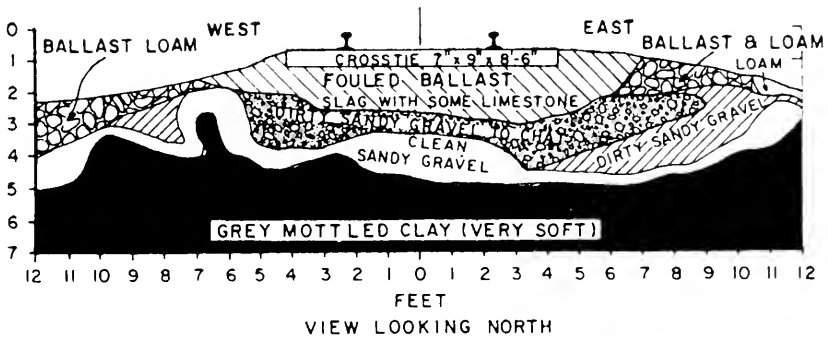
TYPICAL CROSS SECTION OF EXISTING TRACK
